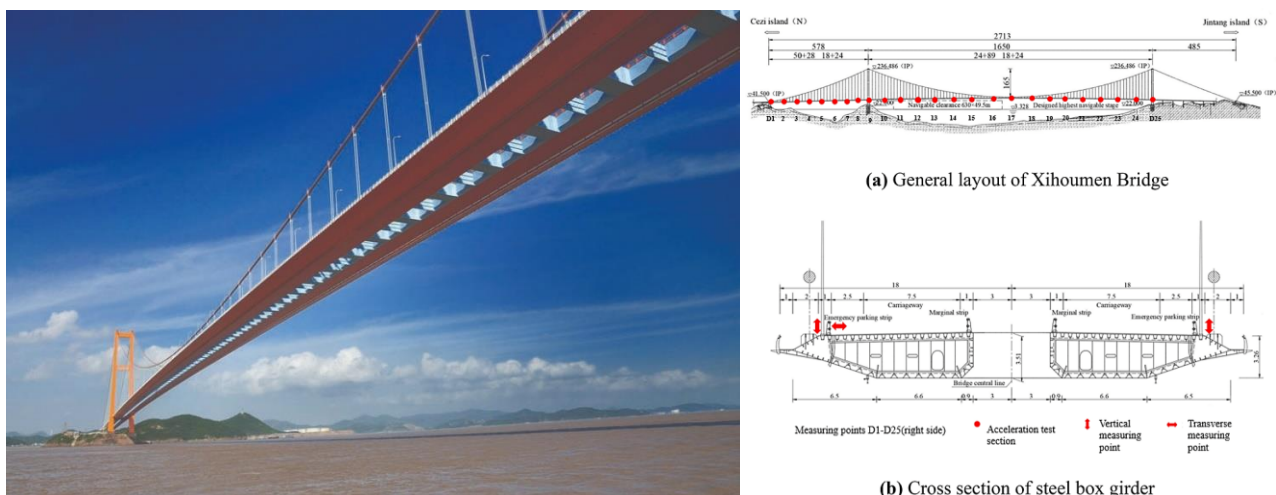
Xihoumen Bridge, China (2009)(left) [5]; Xihoumen Bridge aerofoil twin box cross section (right) [38]
